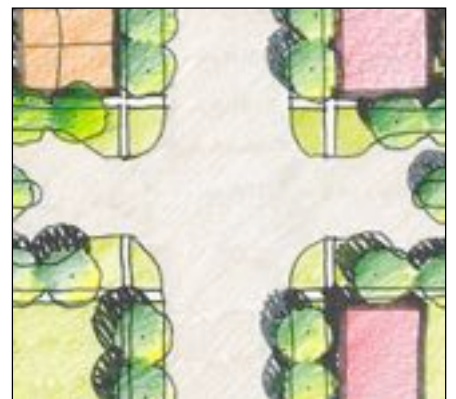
Intersection Improvements - “Bulbed-out” corners.
